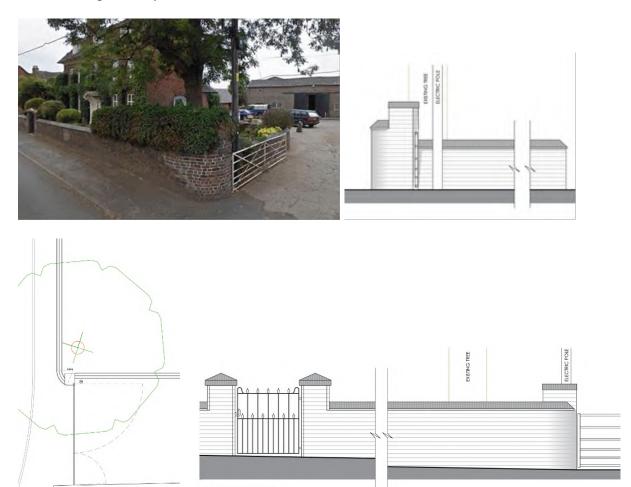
This looming, rather forbidding aspect of Old Hall Farmhouse, where it towers over
